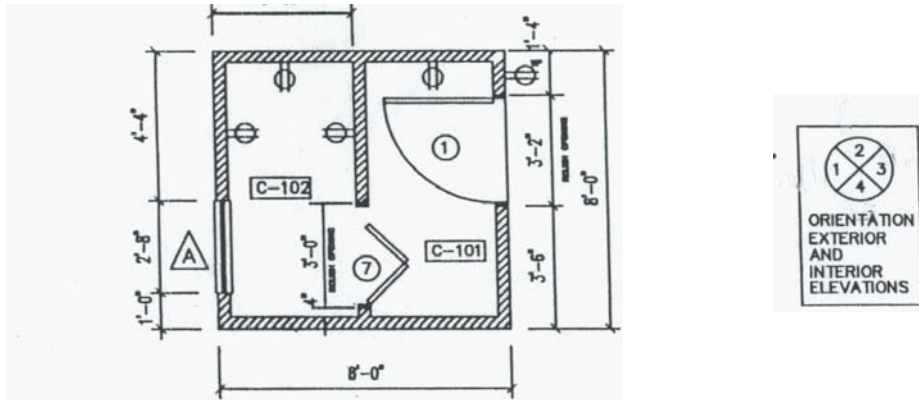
Floor plan for Modules S-2 and C-2. Walls were numbered according to the orientation key. Wall 1 is the North wall. Compass orientations are nominal.
